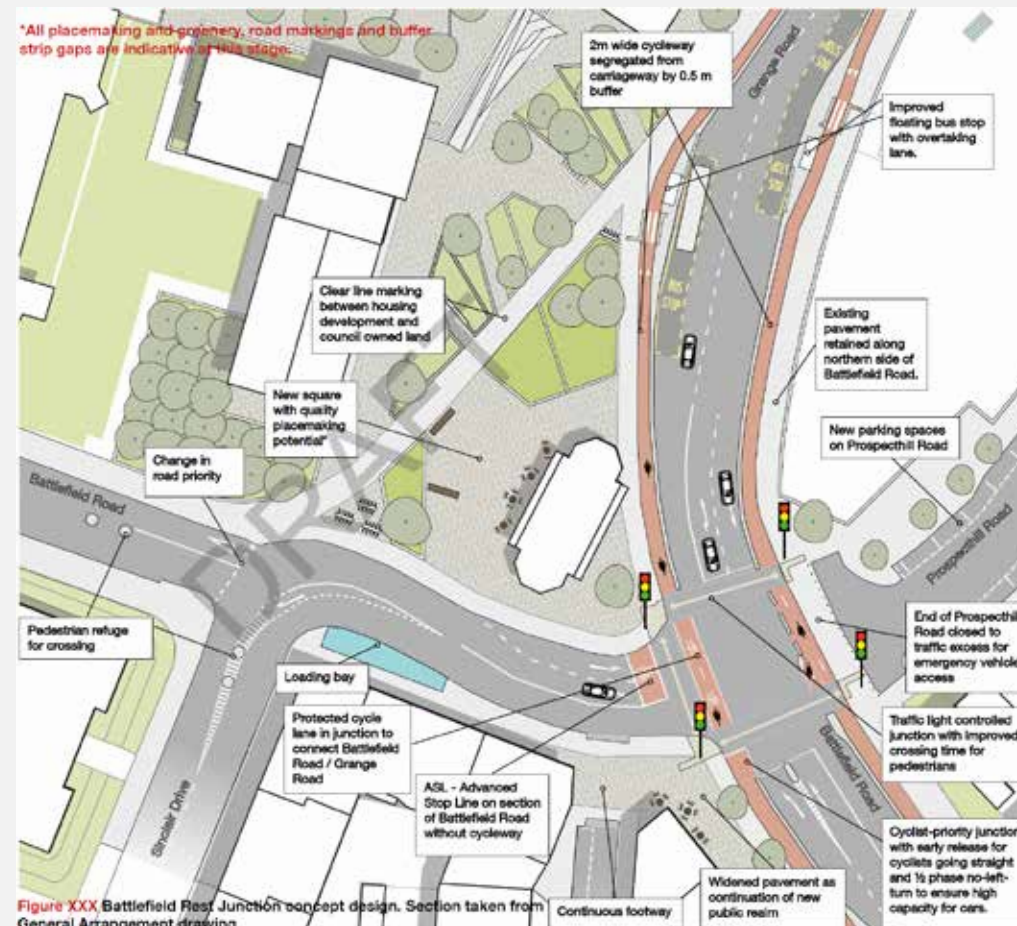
Figure XXX Battlefield Rest Junction concept design. Section taken from General Arrangement drawing
